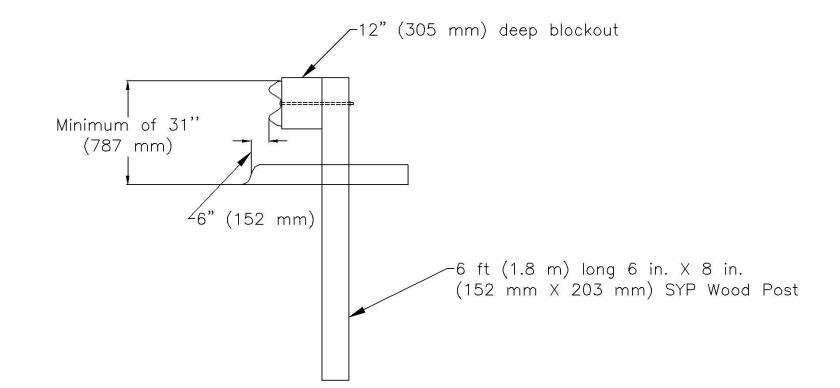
SYP Wood Post MGS Adjacent to Curb Cross-Section
